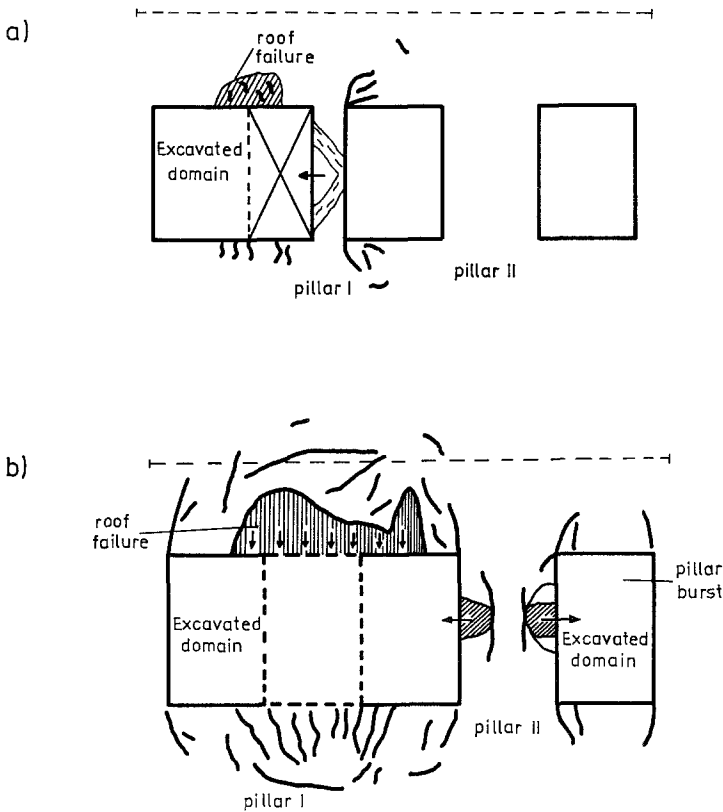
Failure modes of a) pillar I, and b) pillar II accompanied by roof failure
